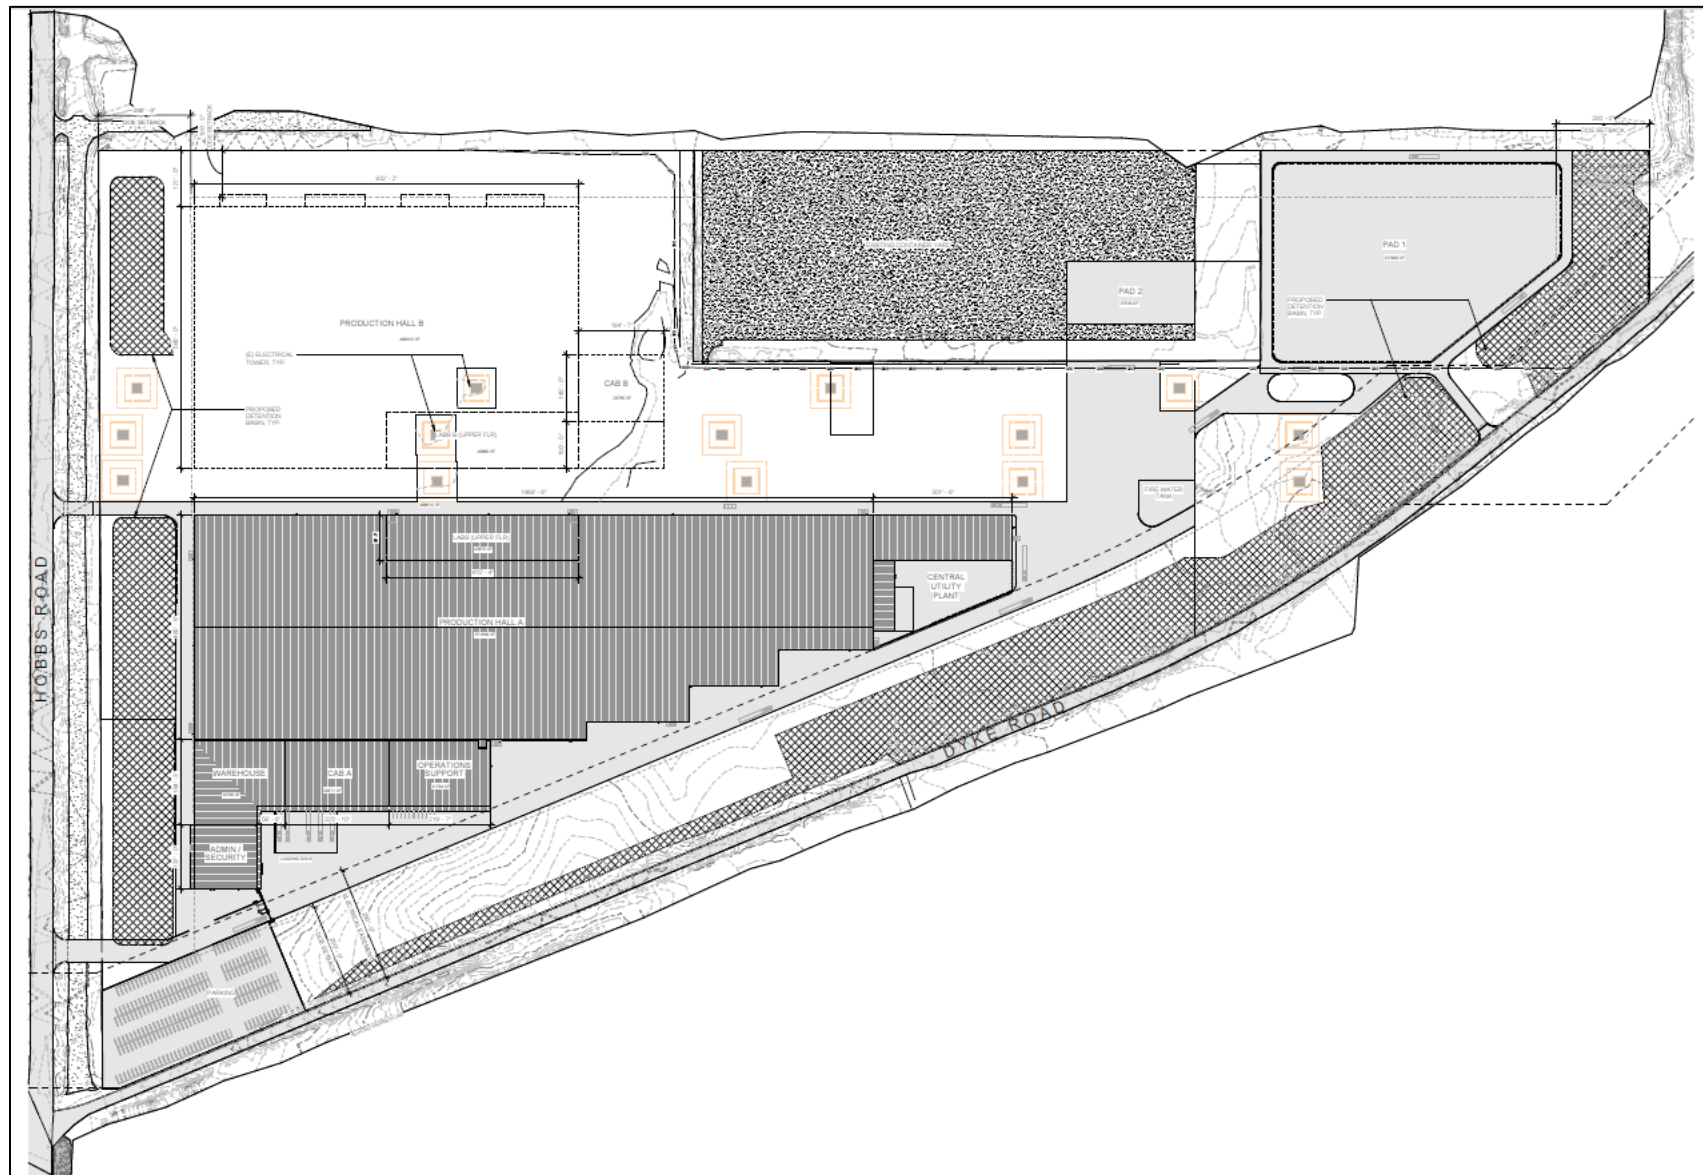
General Matter Paducah Enrichment Facility Conceptual Site Plan
